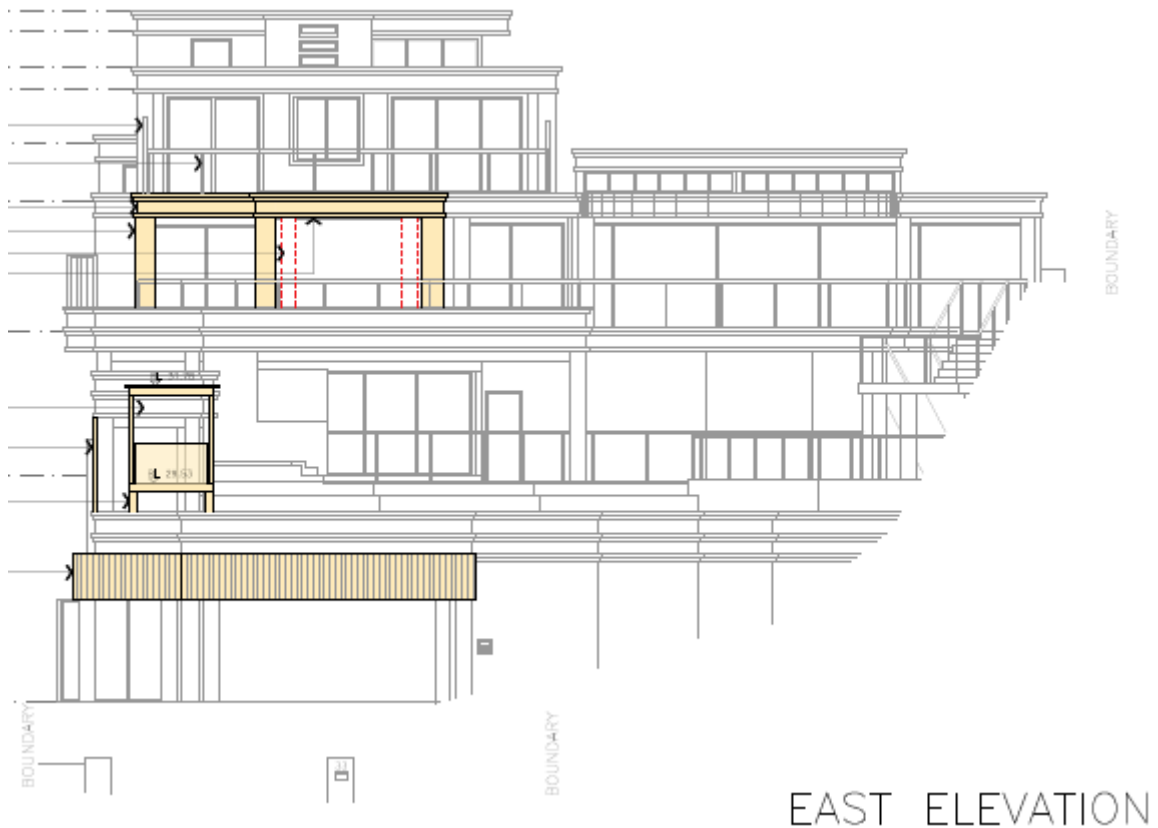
Extract of East Elevation Plan (Source: Simon Chan + Associates).
